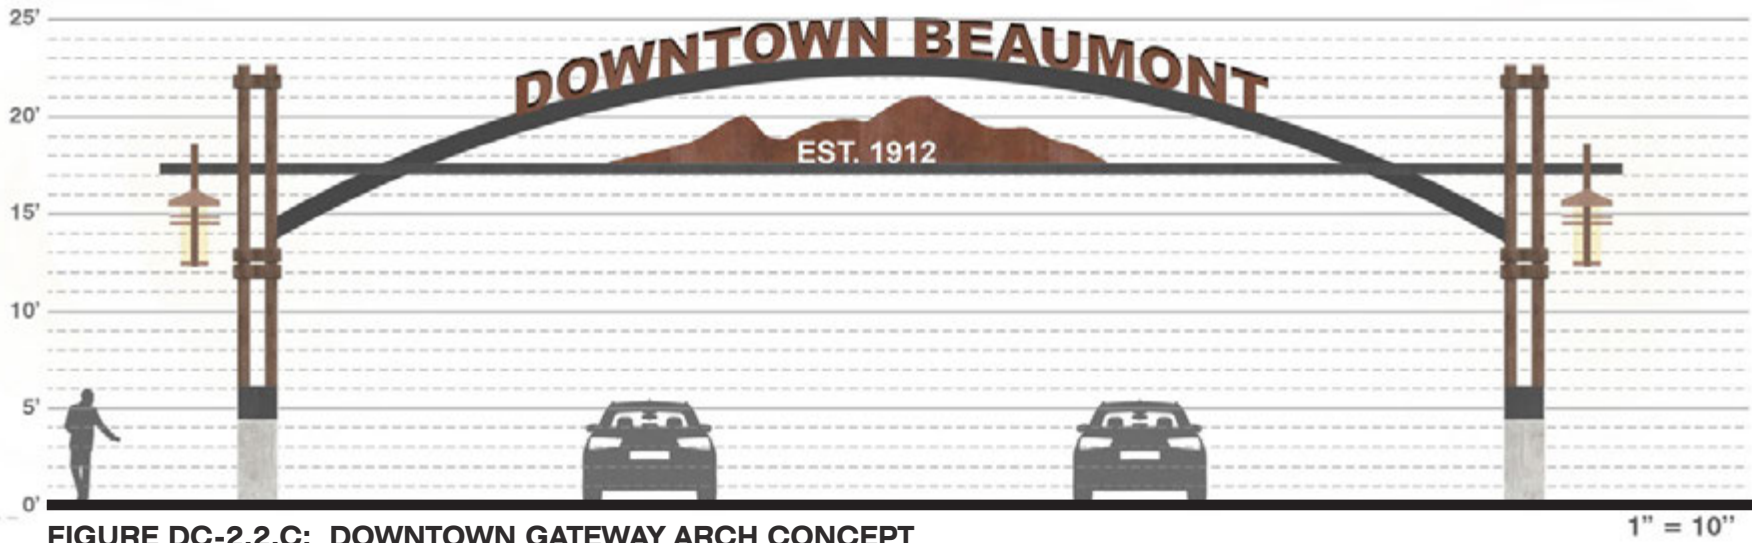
C: DOWNTOWN GATEWAY ARCH CONCEPT
